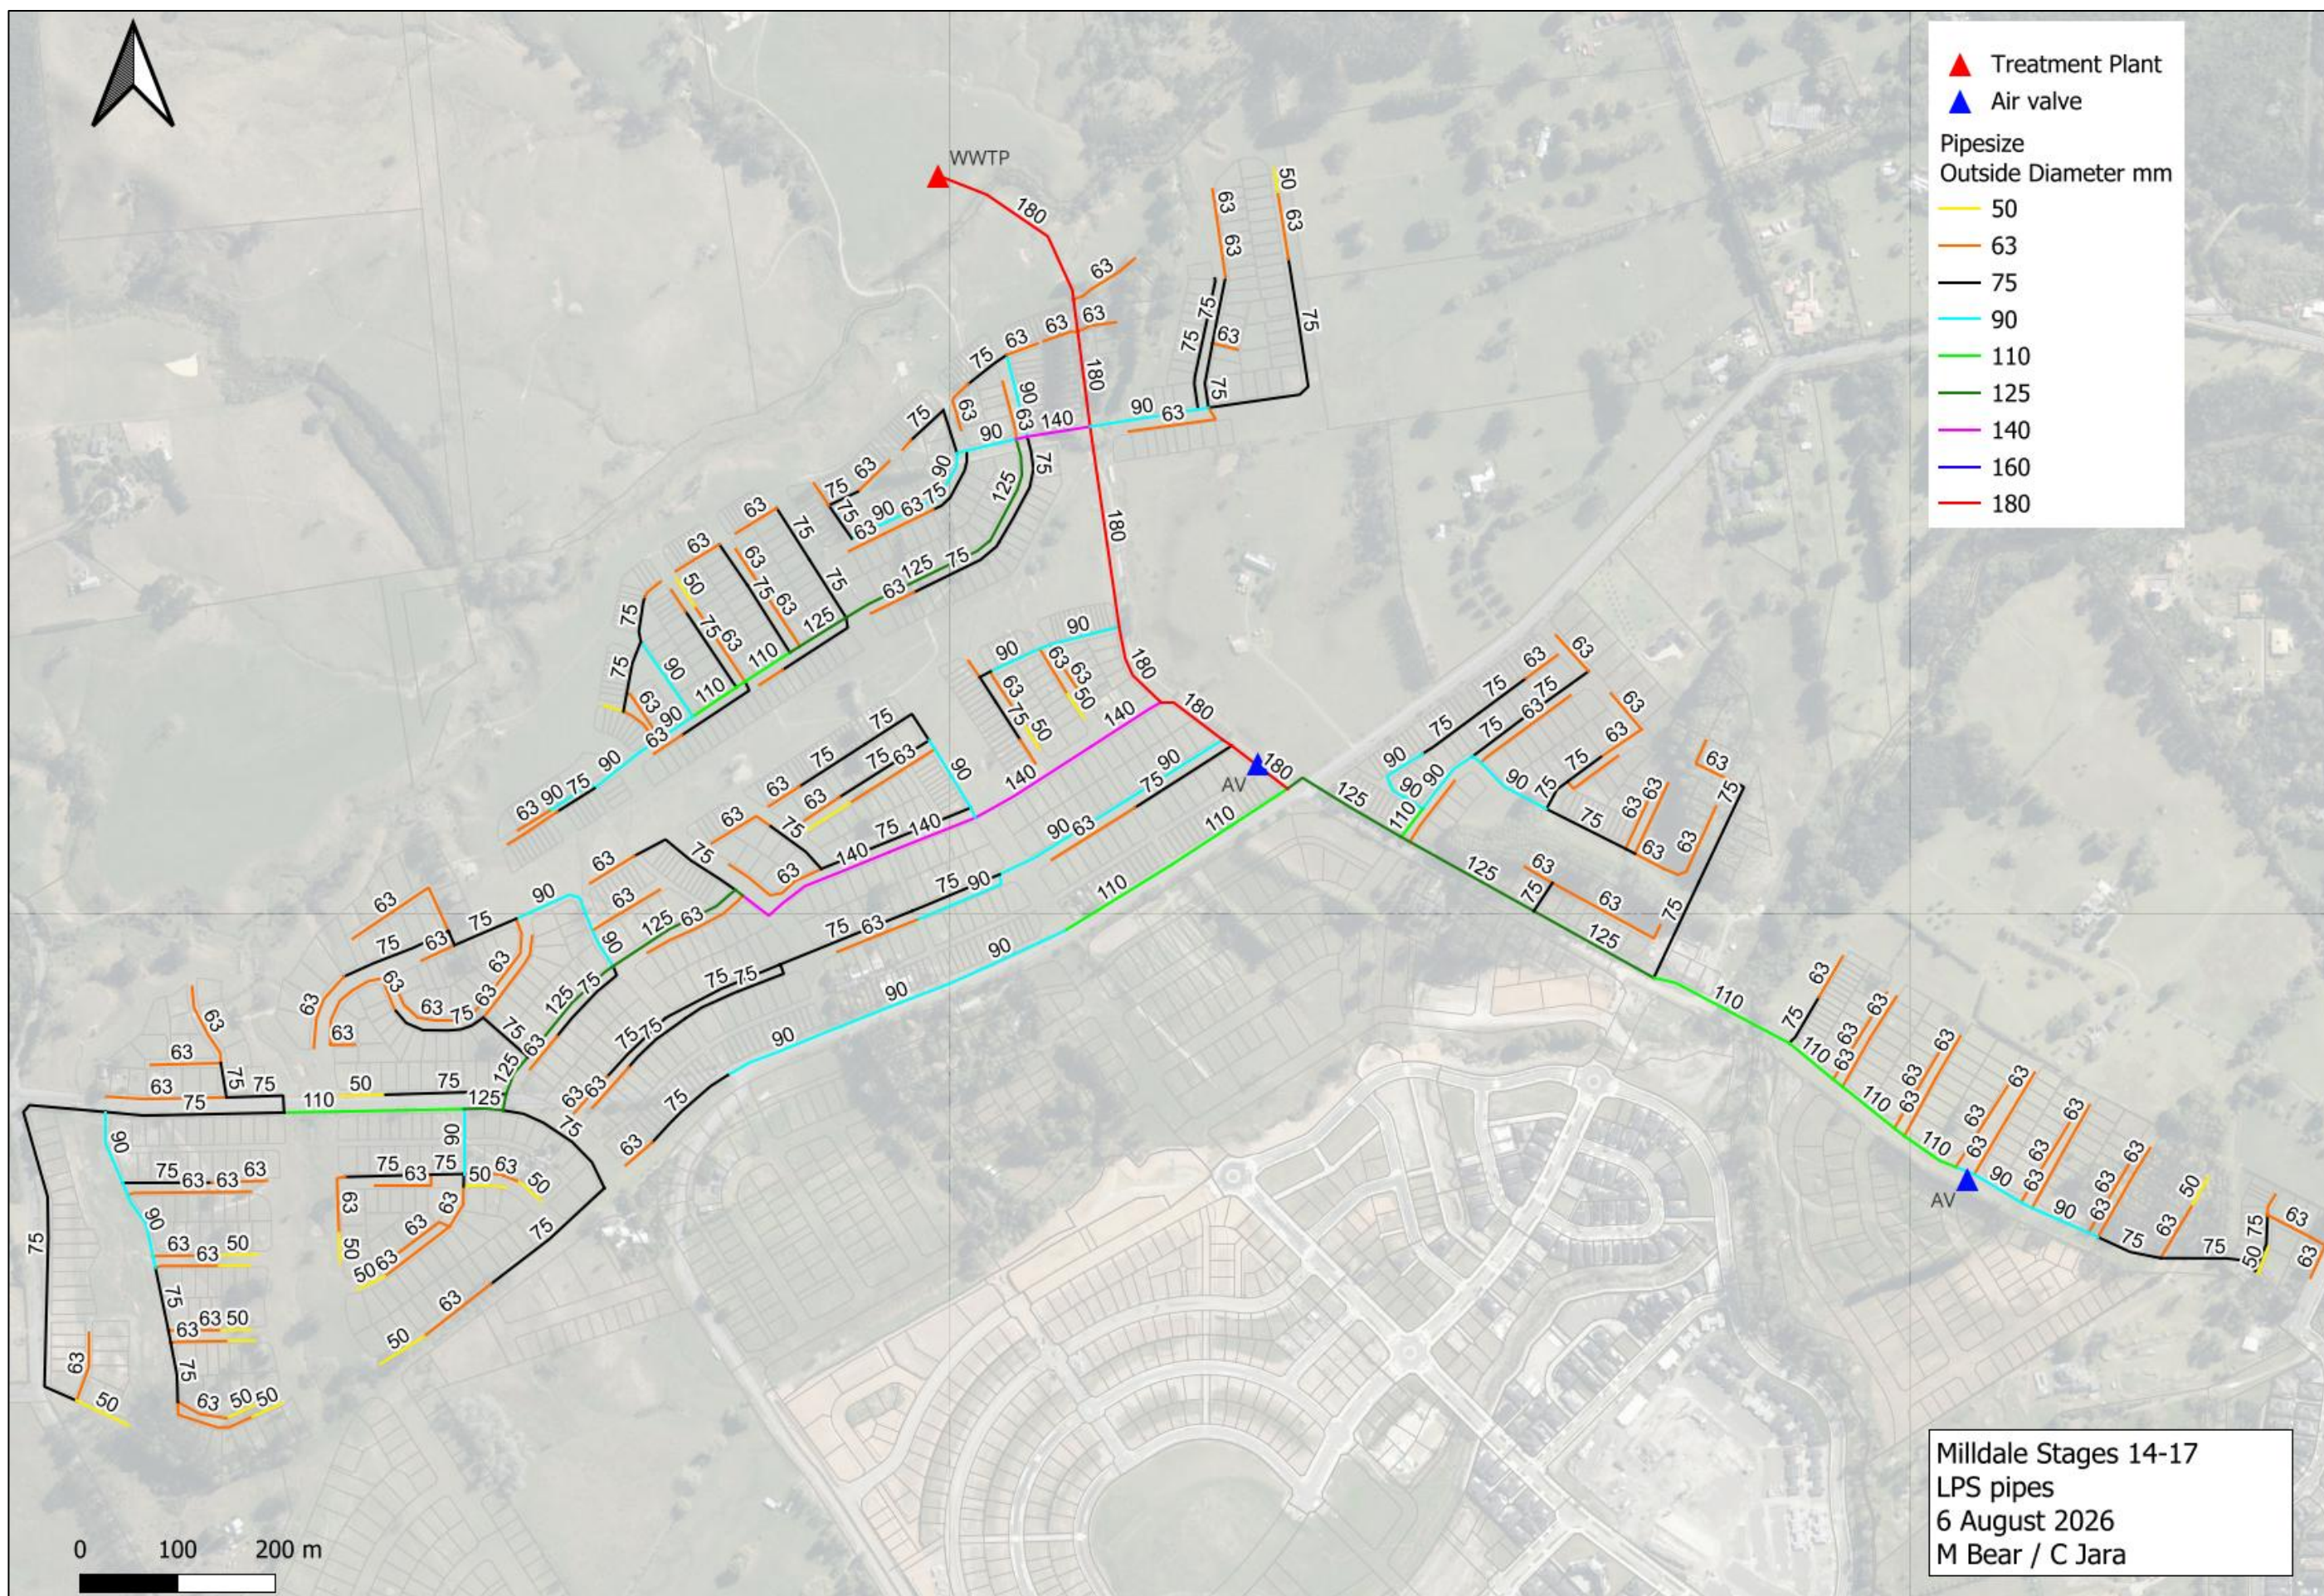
Proposed network layout and sizing for Milldale Stages 14-17 Fast-track
